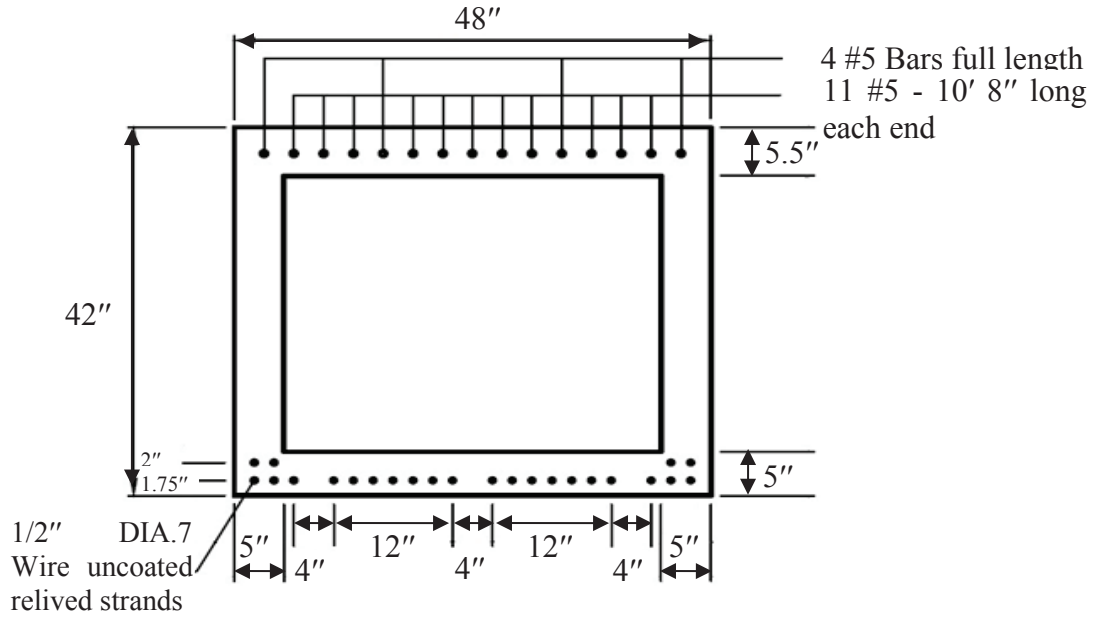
A typical PSBB cross-section of ATB Bridge.
